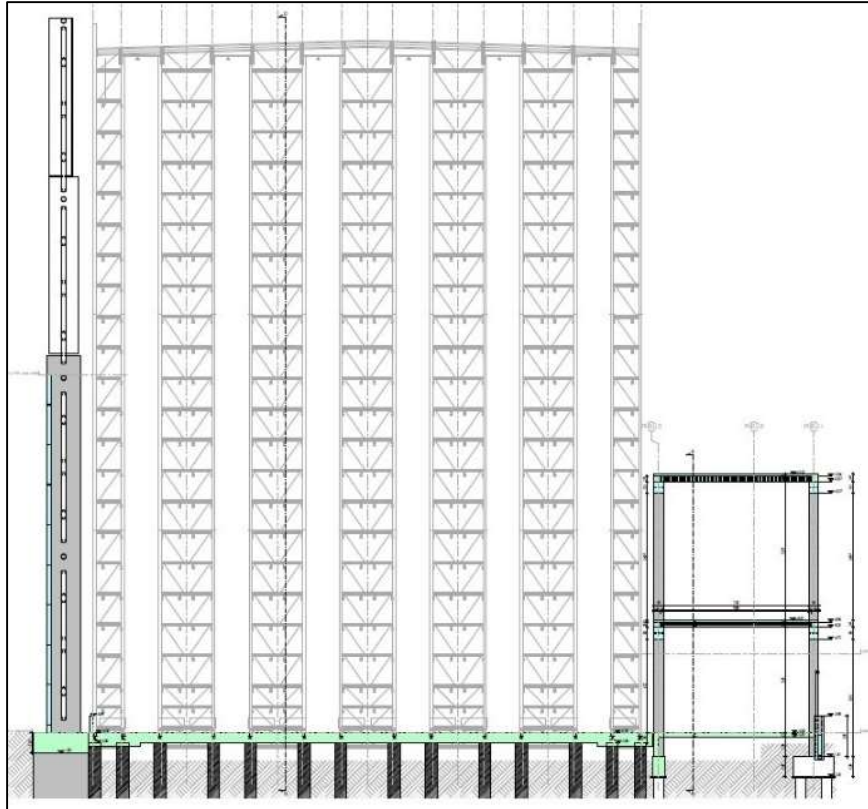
Typical section of the planned high-bay warehouse (firewall on the left, service building on the right)
